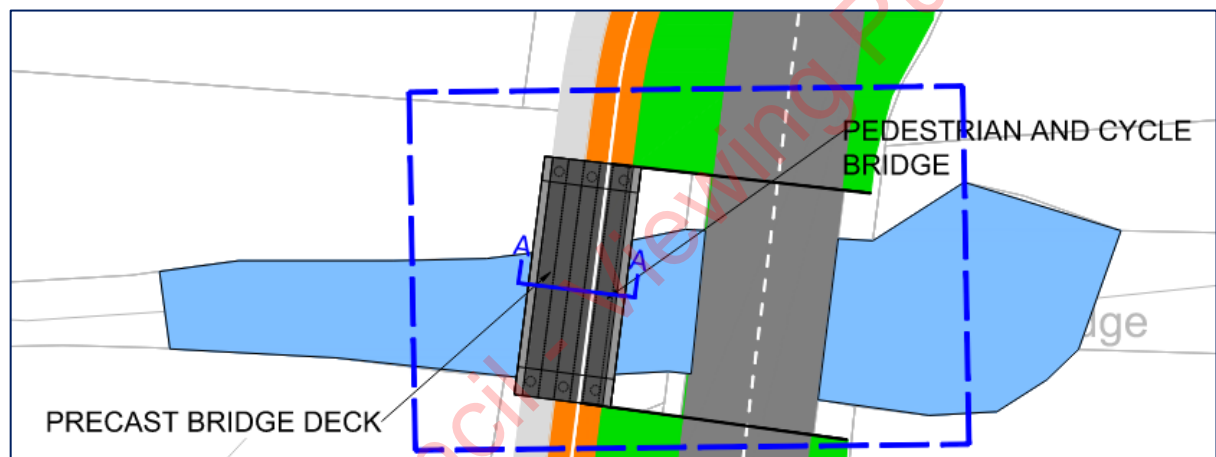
Schematic Plan of new Pedestrian and Cycle Bridge Structure
